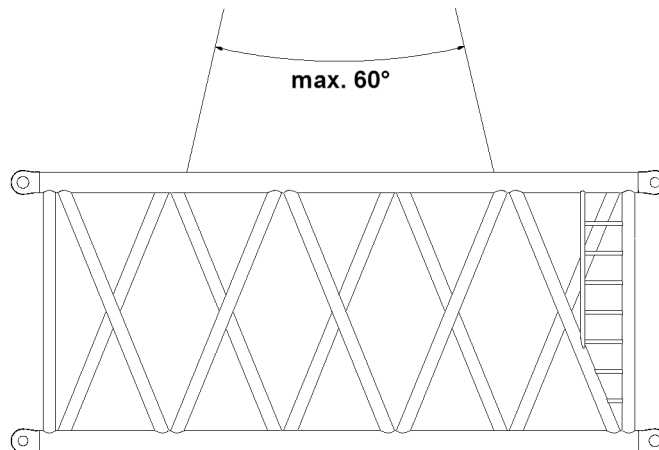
Fastening equipment, spreading angle maximum 60°
